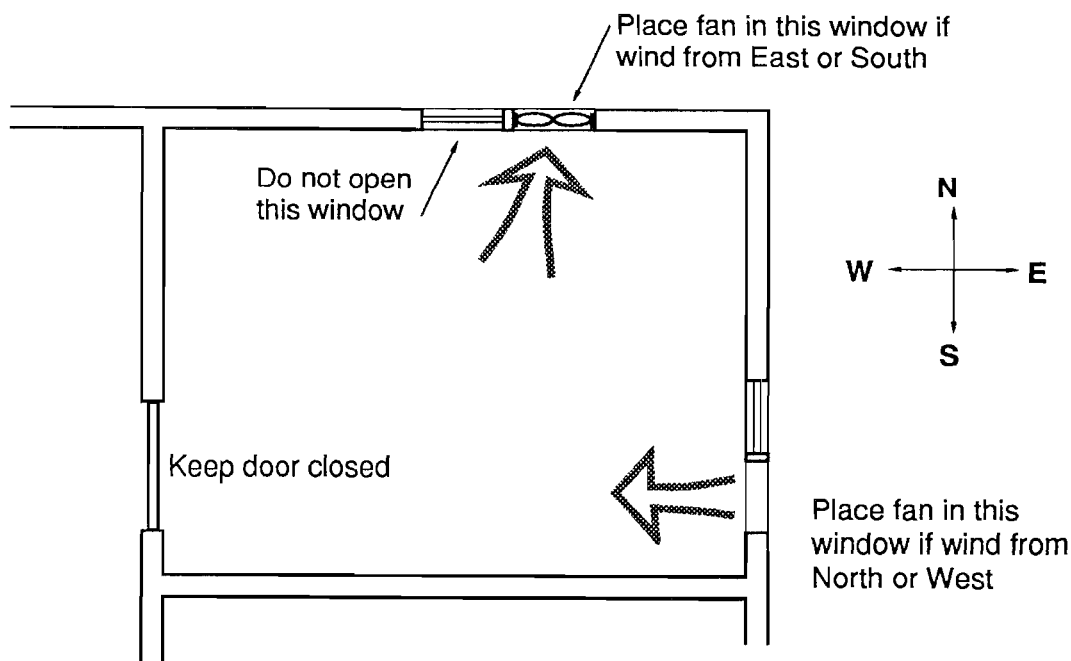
Venting Strategy for a Typical Containable Room with Windows on Two Walls
